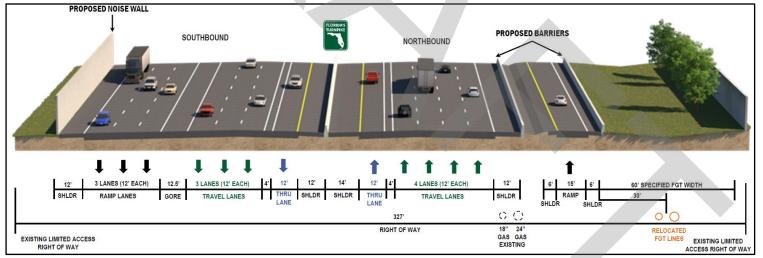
Florida's Turnpike Preferred Alternative Roadway Section between Wiles Road and Sawgrass Expressway
